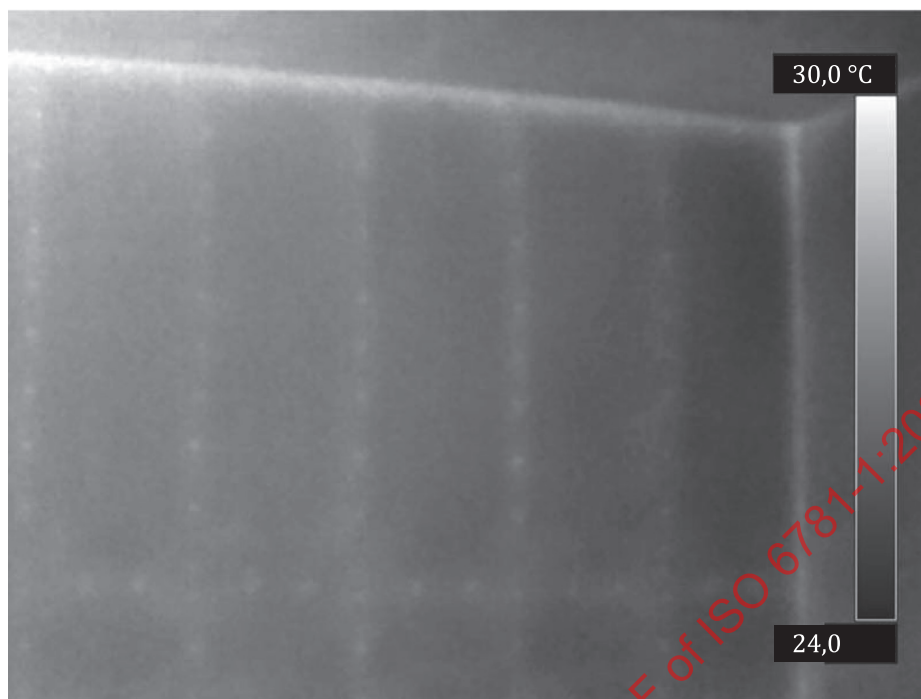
Wall — Insulated stud wall with good construction — Qualitative illustration of thermal heat gain
